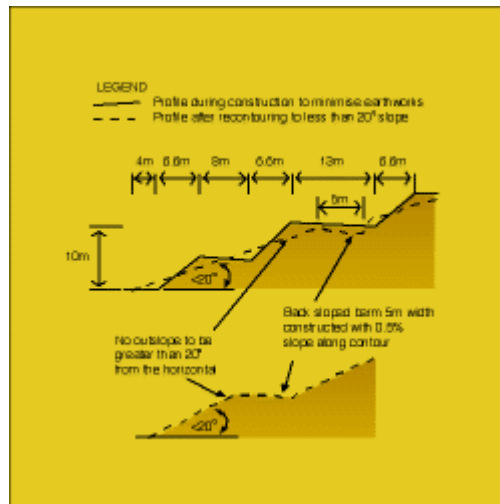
Basic Slope Profile For Most Waste Dumps, Detail of Waste Dump Construction Technique (after Department of Minerals and Energy, WA 1996)
